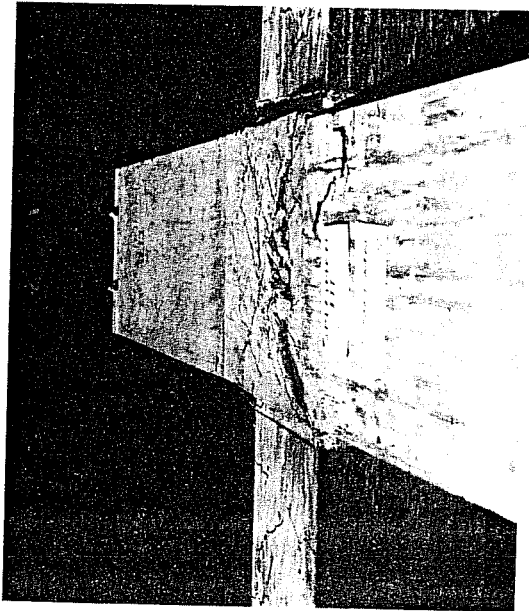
Spalling of joint cover concrete (Specimen III)
